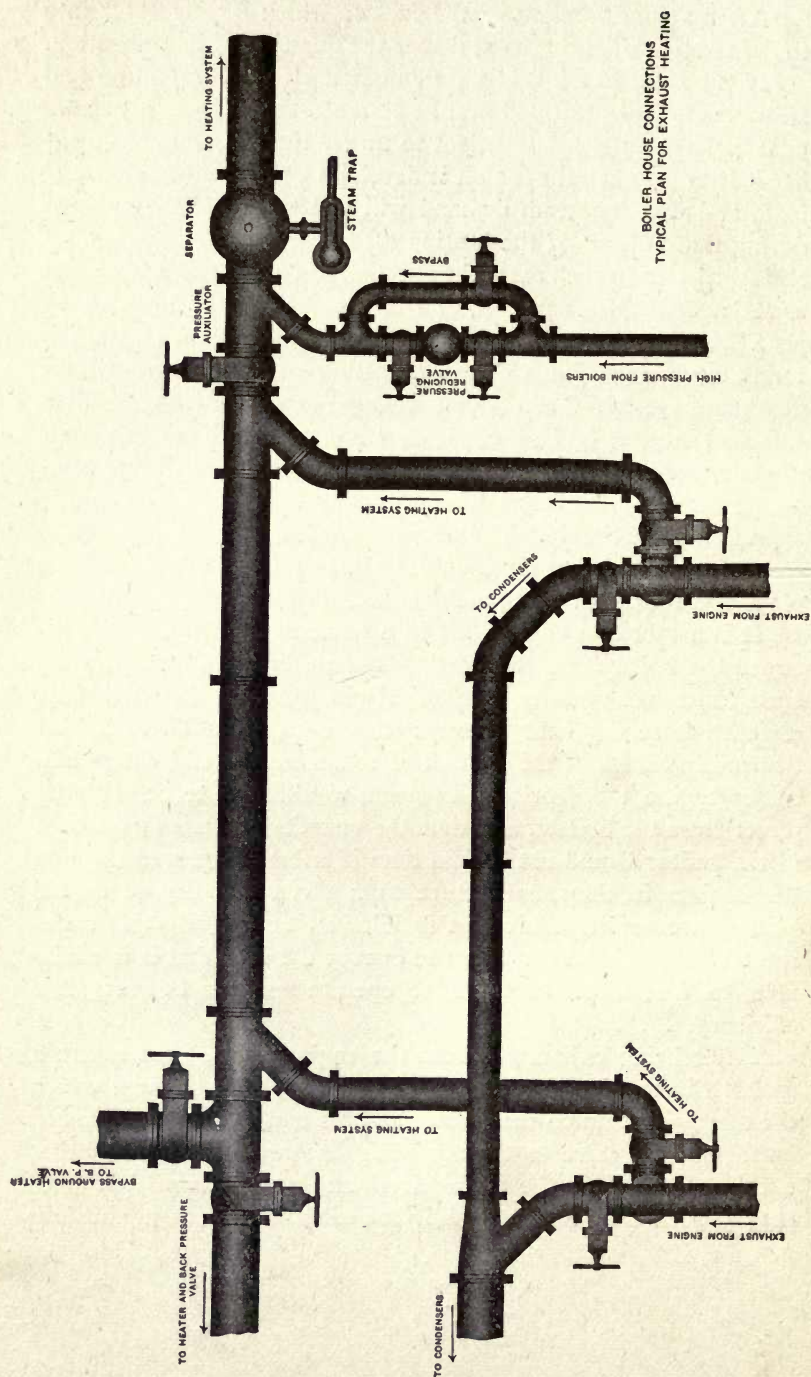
Boiler House Connections. Typical Plan for Exhaust Heating.
